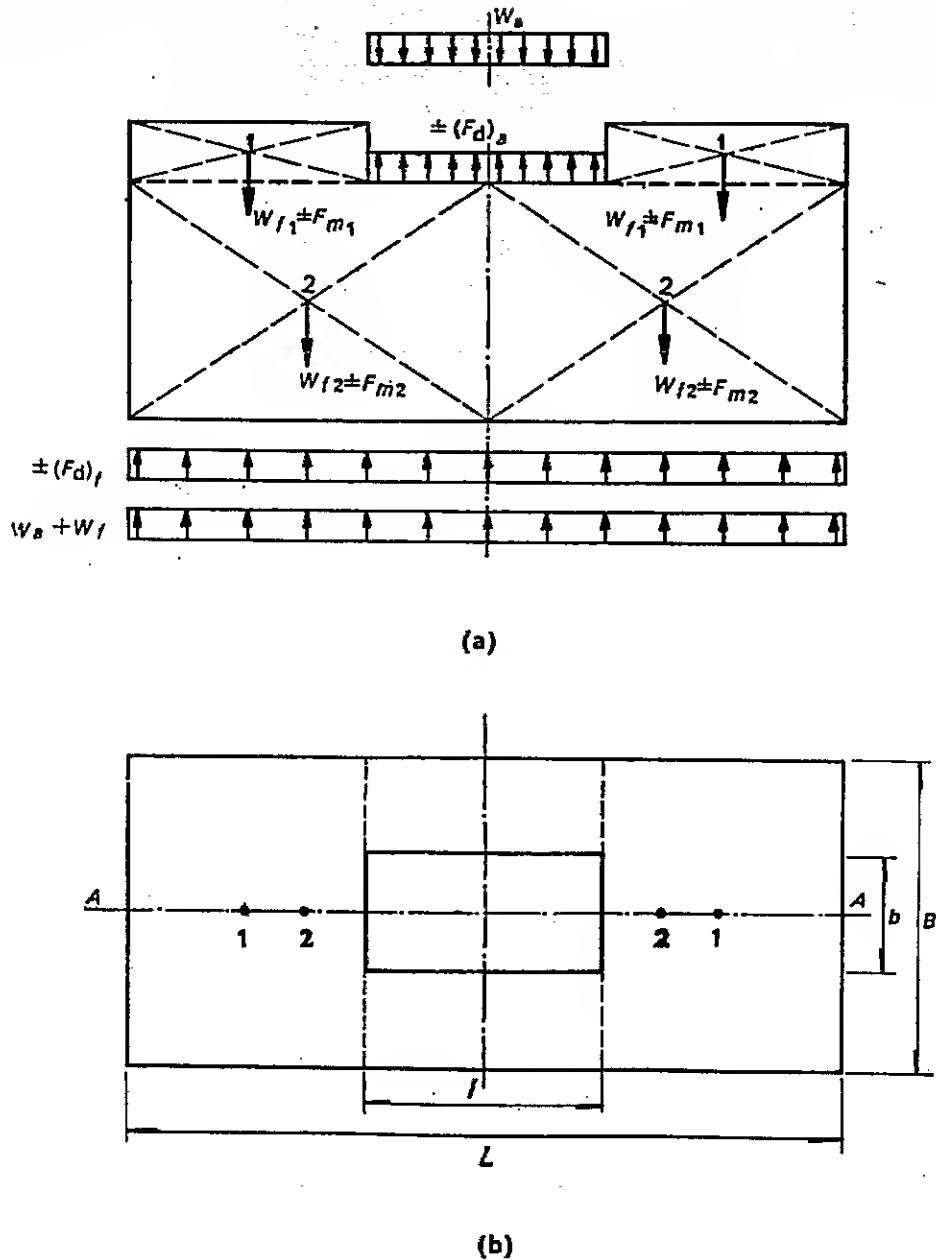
Forces Acting on a Hammer Foundation—(a) Section A-A, (b) Plan.
